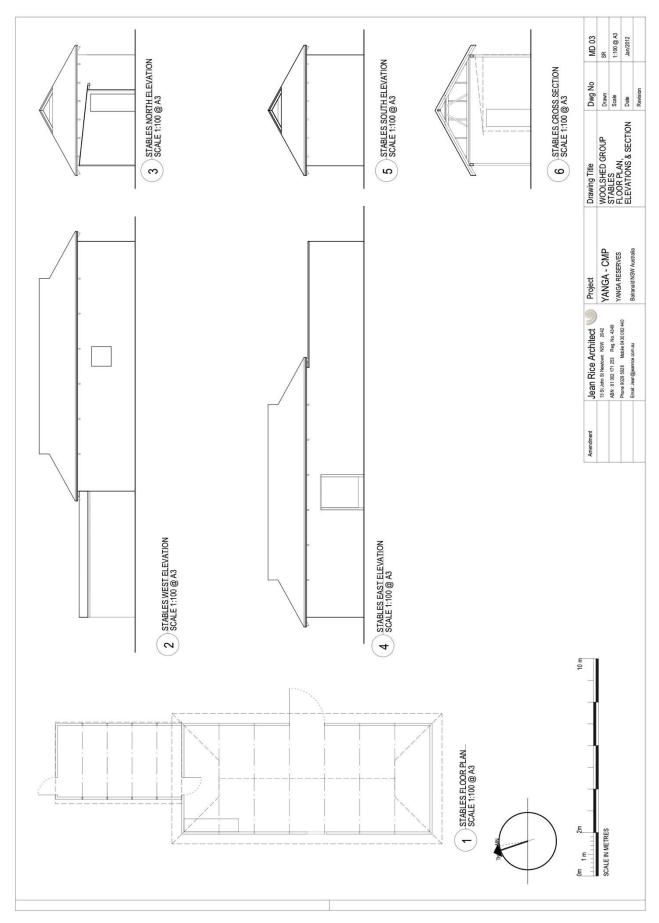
Woolshed Group Stables floor plan, elevations and cross section. Jean Rice Architect, site assessment 2009.
